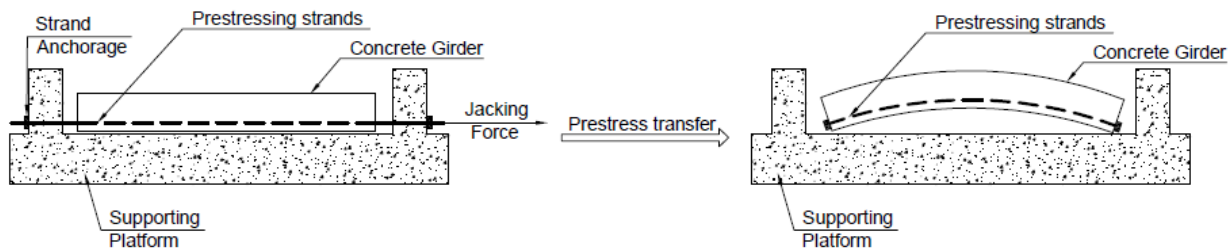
Transfer of Prestress from Prestressing Strands to Concrete
